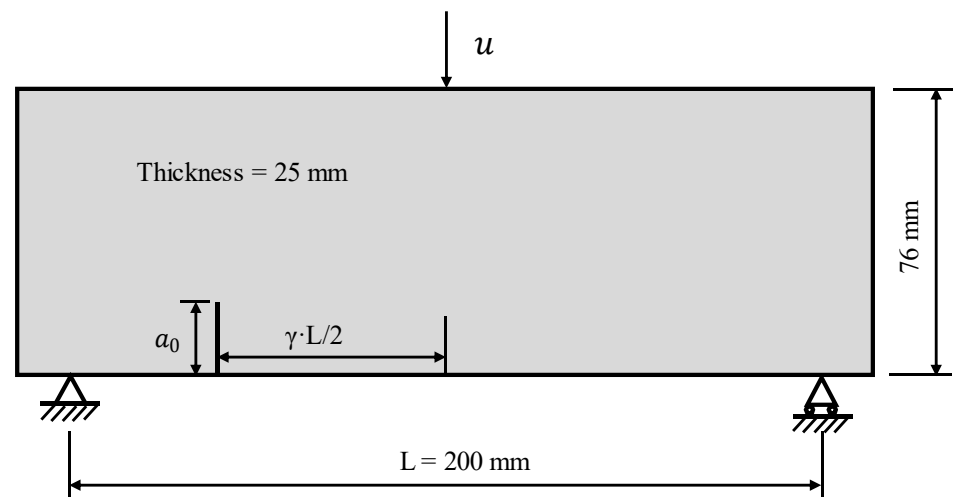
Notched concrete beam: geometry, loading and boundary conditions.
